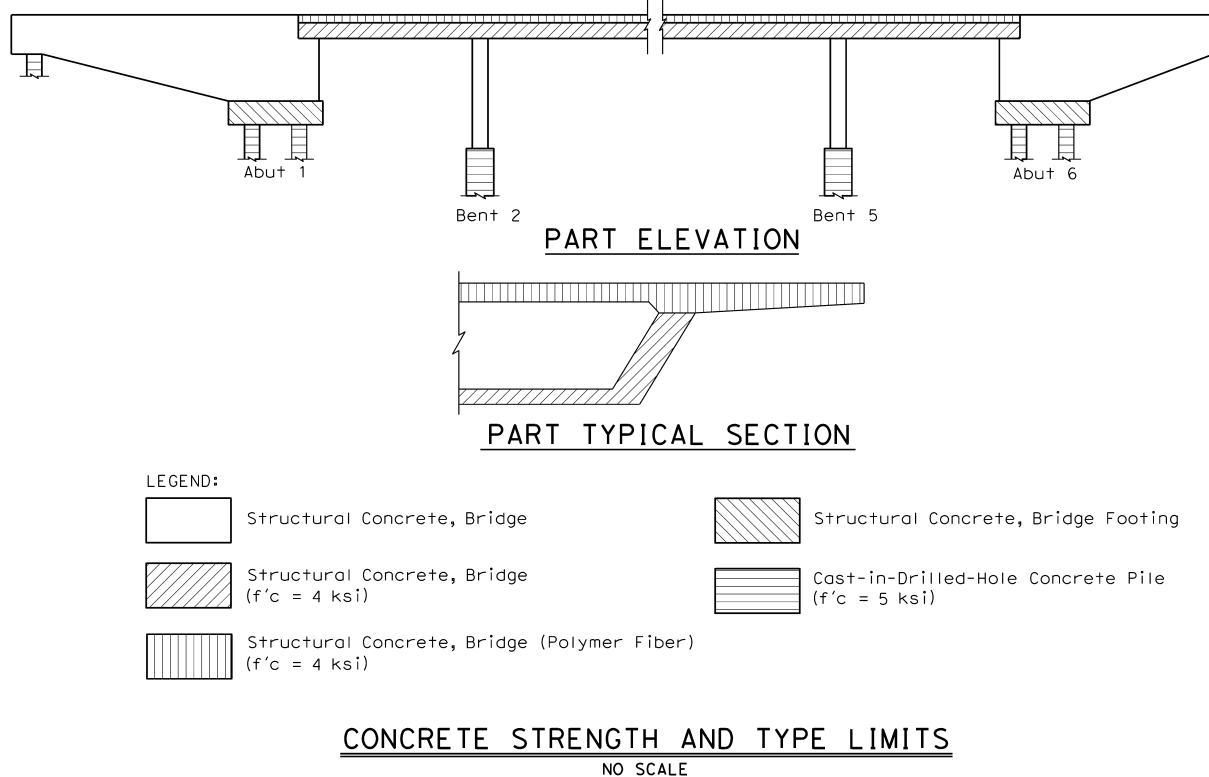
Concrete Strength and Type Limits Diagram Cast-in-Place Prestressed Box Girder Bridge
